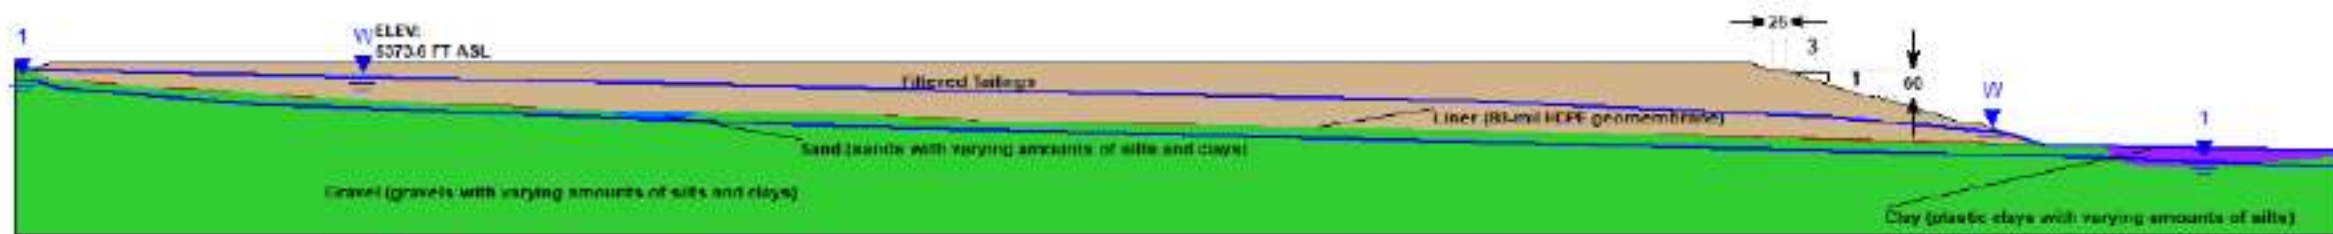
Tailings Stacking - Stage 4 – Section D-D'
